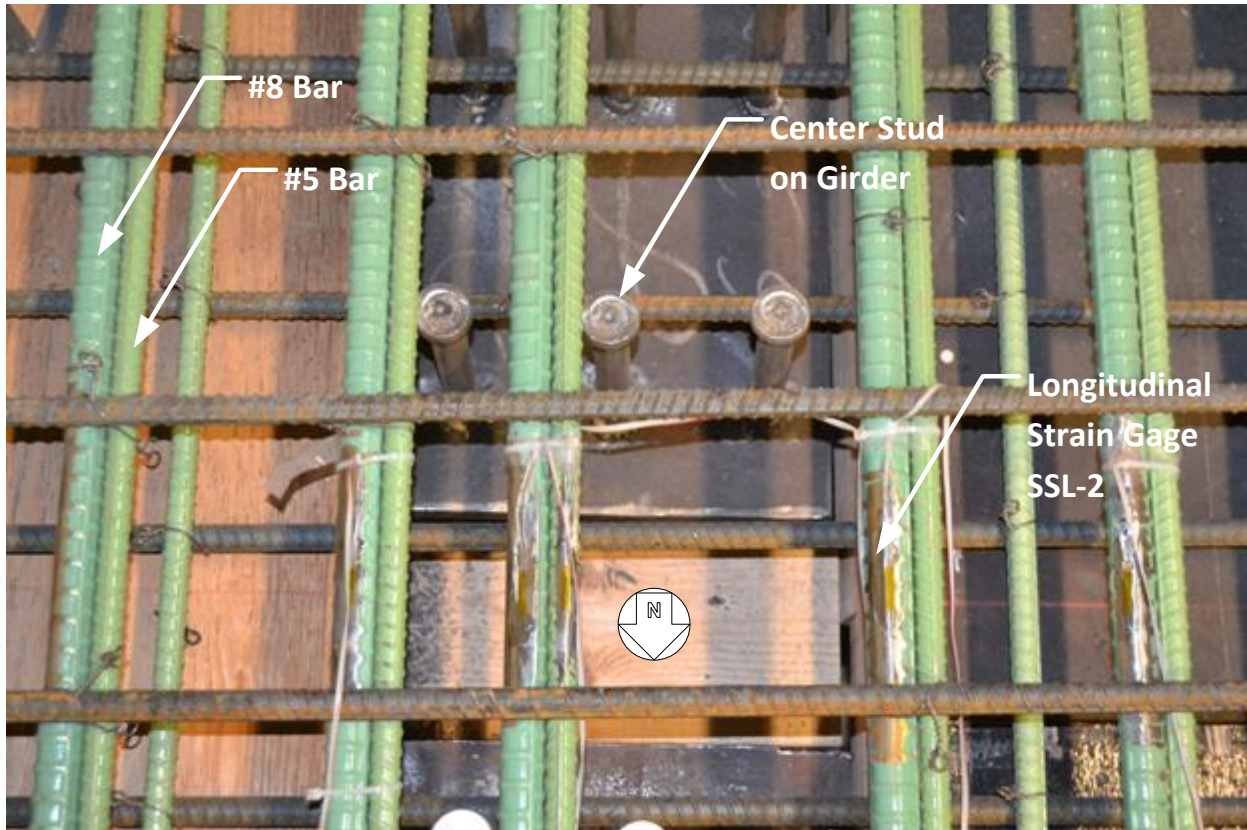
Strain Gages Attached to Reinforcing Steel (April 2014)
